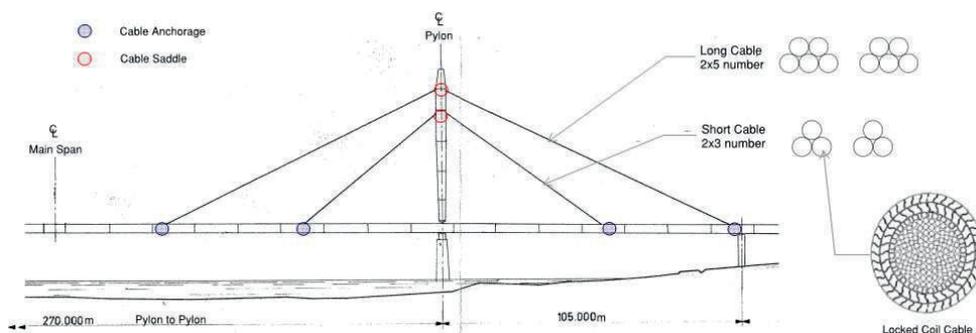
Half Elevation of Main Span at Ewijk and Cable Details
